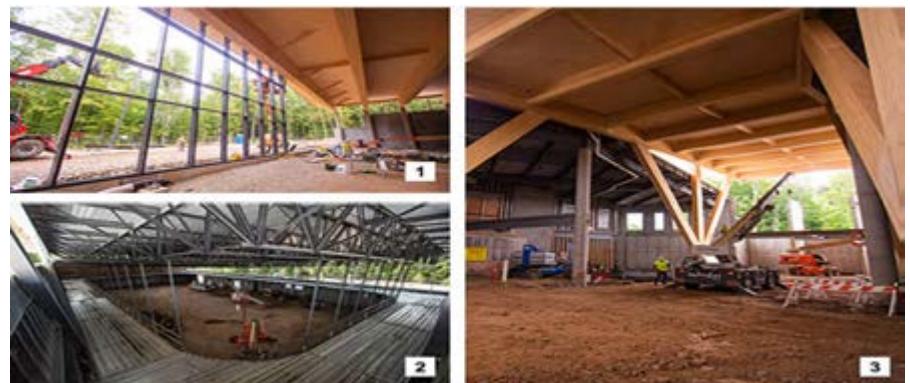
Interior view of the glass curtain wall in the pool (2) Aerial view of Area C fieldhouse (3) Interior view of the entrance and elevated skywalk
